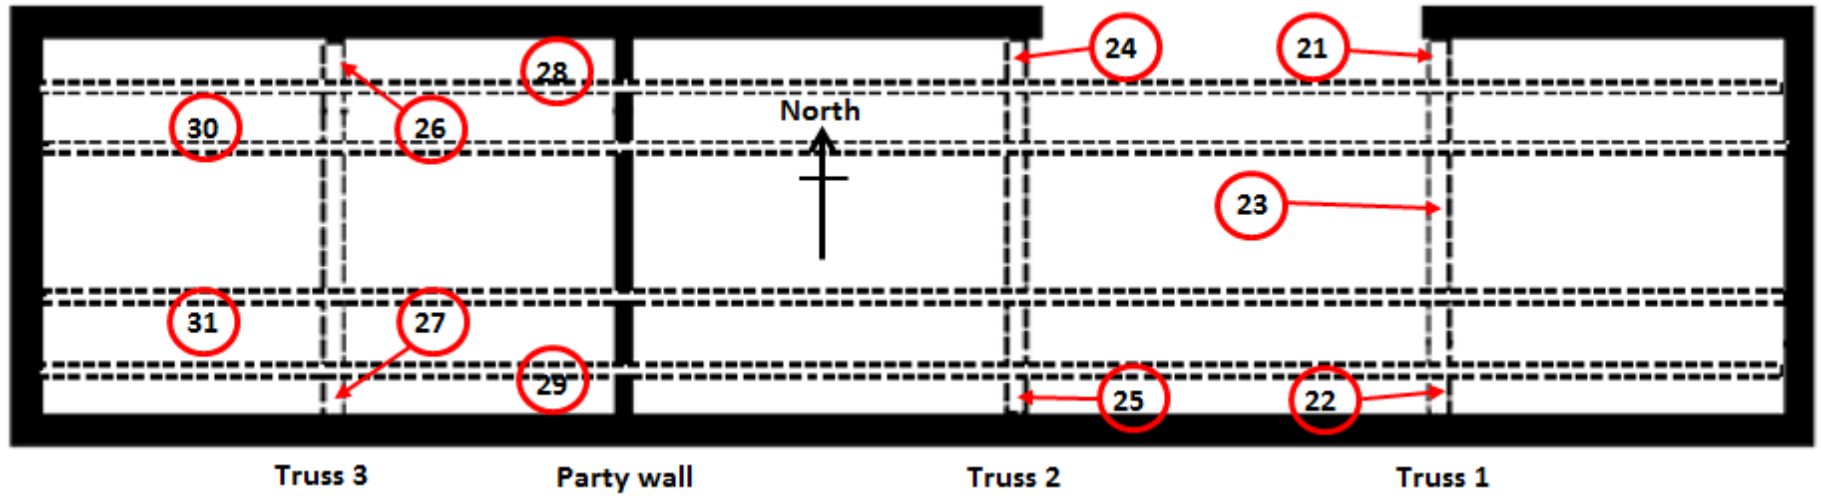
Schematic plan of the Back barn to locate sampled timbers (plan Robert Howard)
